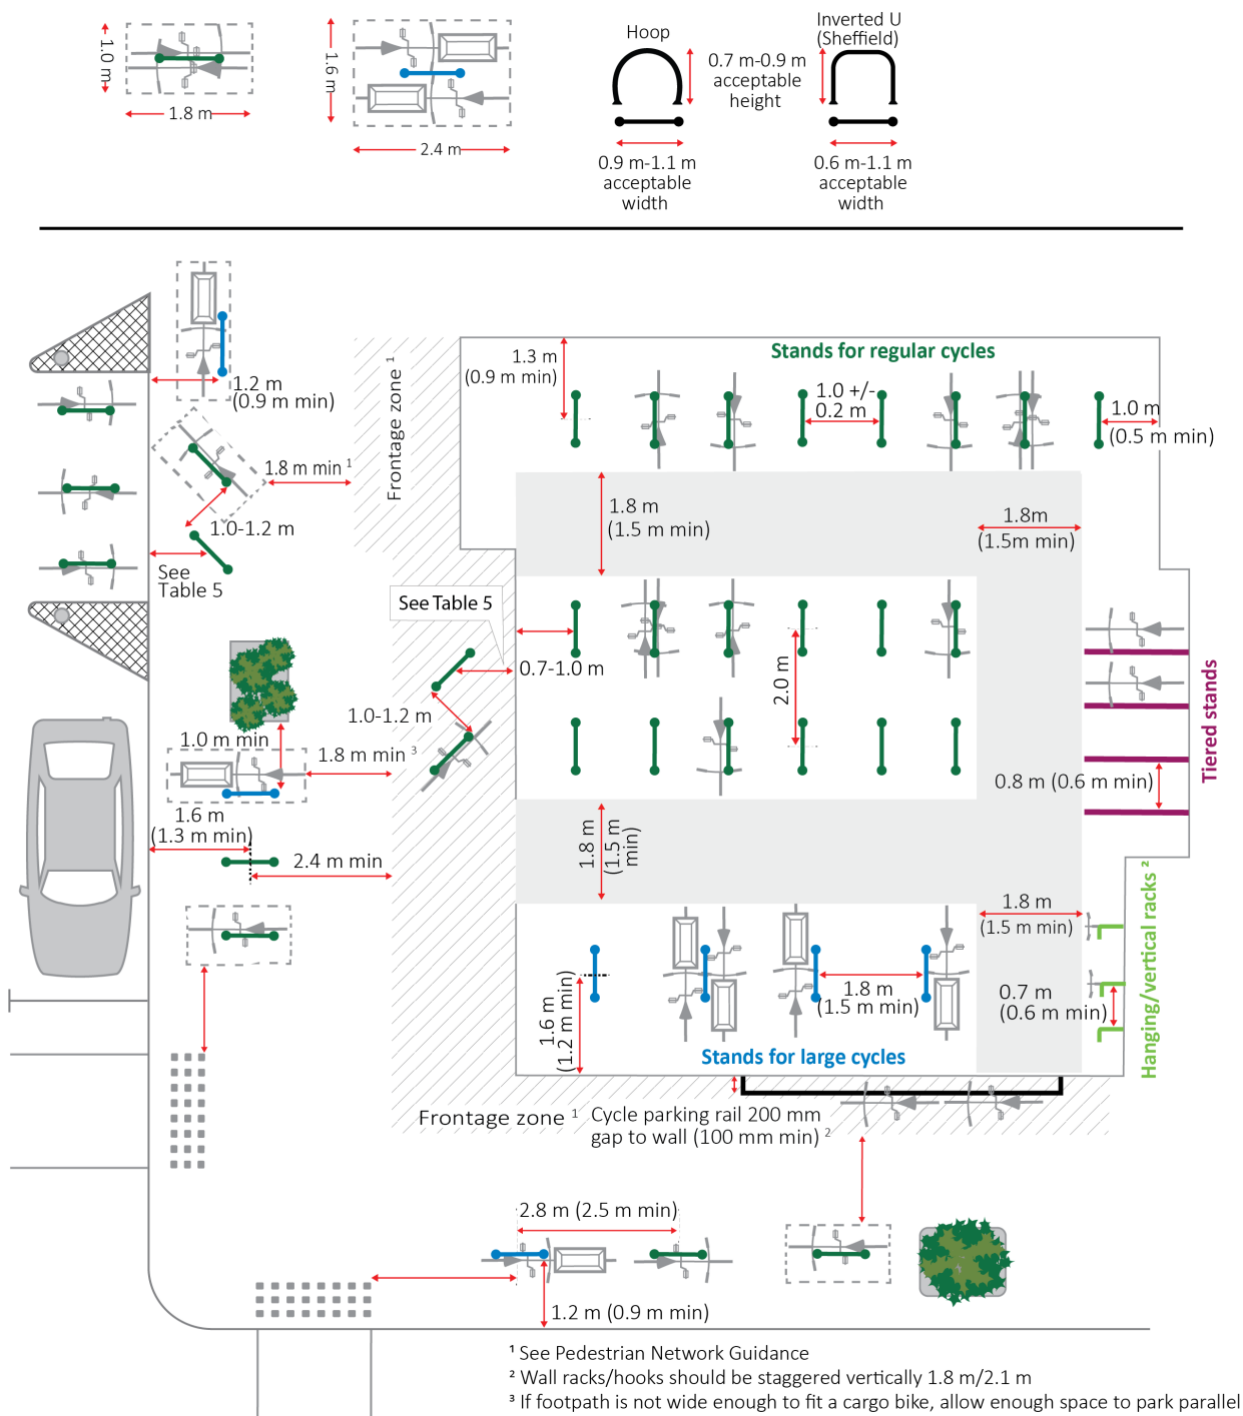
cycle parking envelopes, typical stand dimensions and layouts
